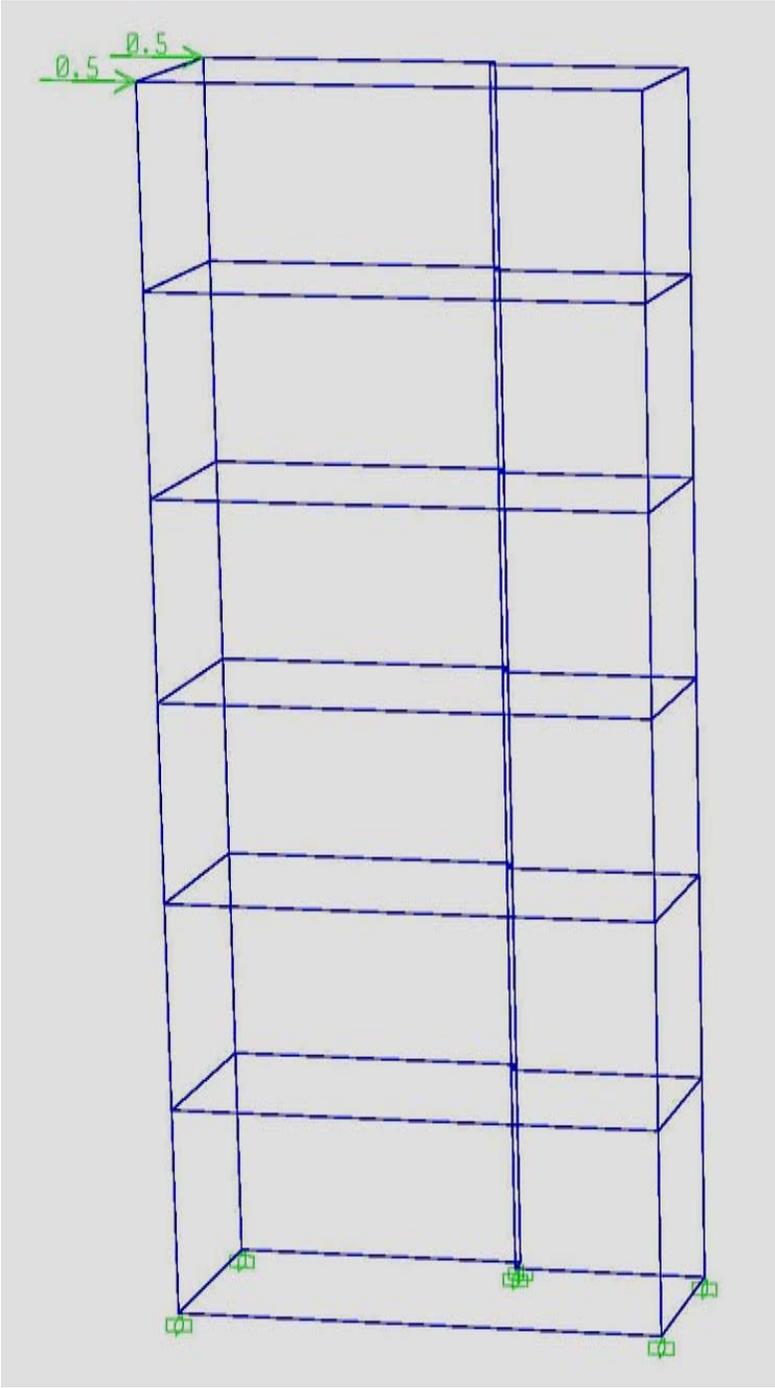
Shear Wall Group 3 Loaded in Y Direction
